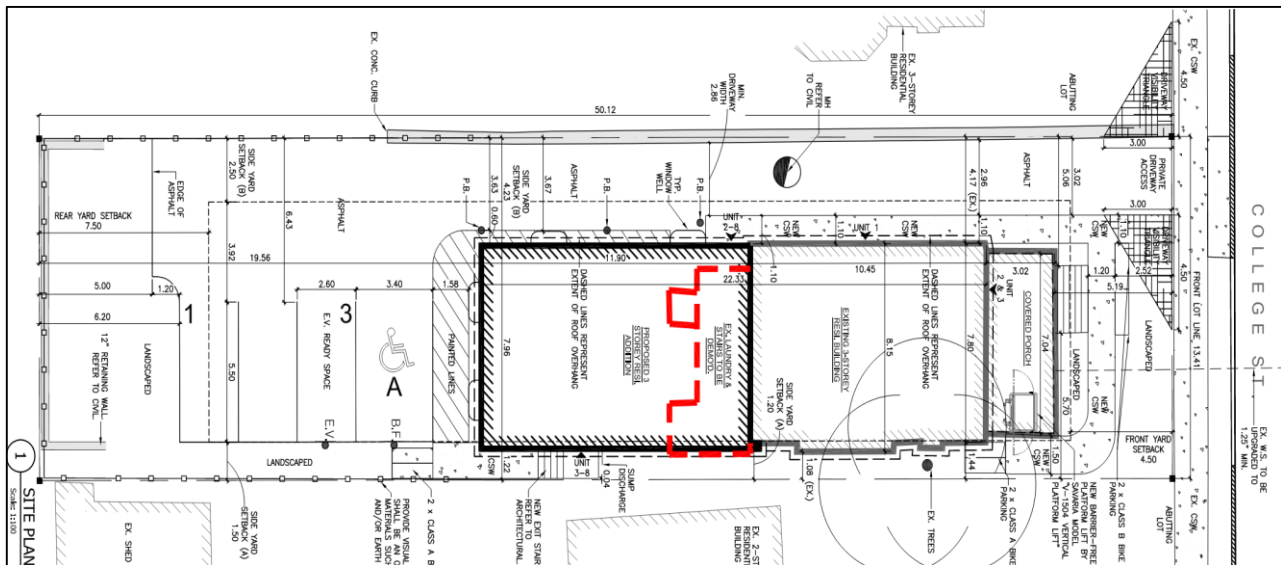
Proposed site plan drawing, showing the existing building (right) and proposed rear yard addition (left).
